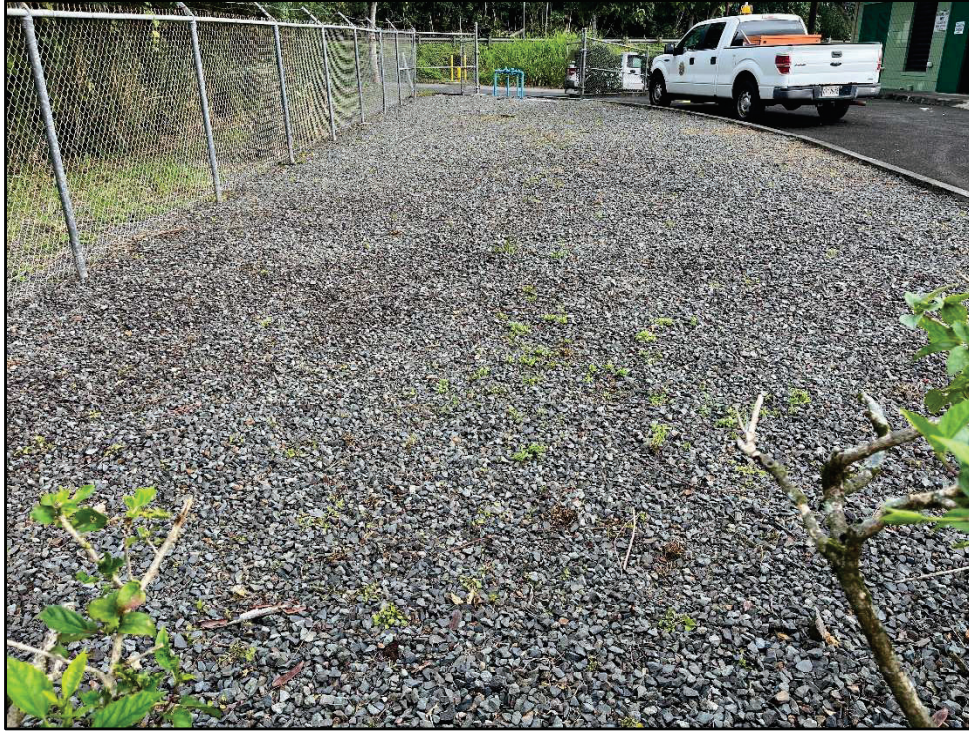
Photo K: Location of proposed new 1,000-gallon AST in west side of Maunawili Park WWPS enclosure, view to northwest
